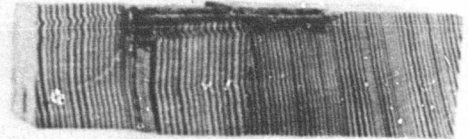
Postshot view of the damaged footings showing the punching damage. Note also the inward bow of the Shot 5 footings.
